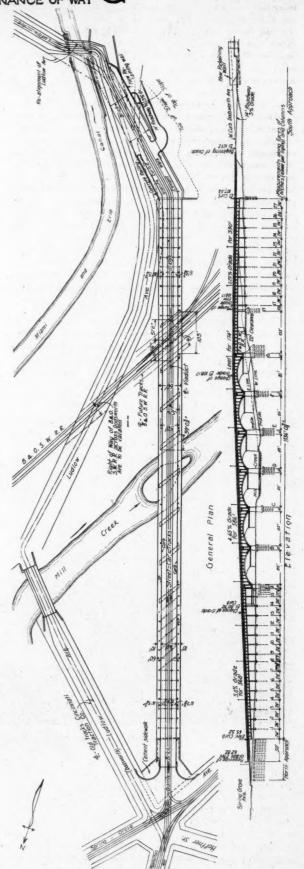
General Plan and Elevation, Ludlow Avenue Viaduct.
